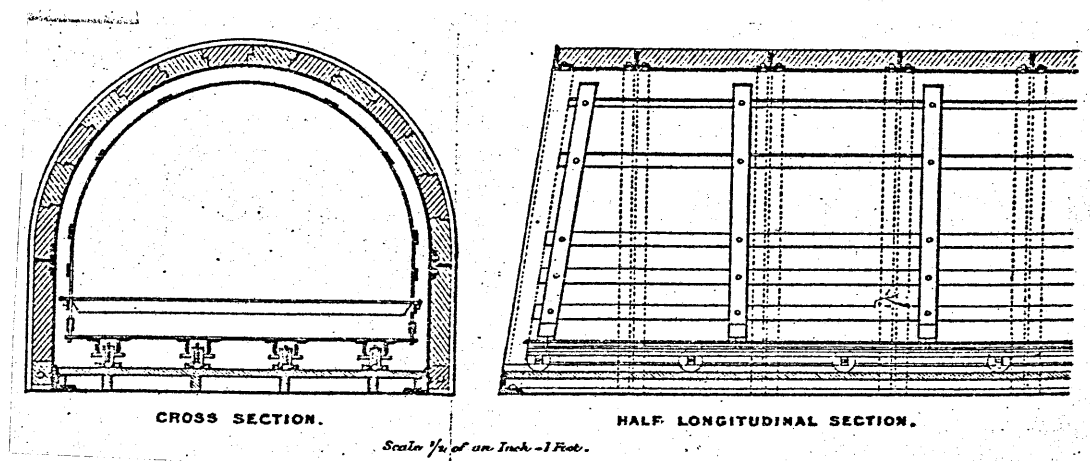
DETAILS OF THE ROLLING CARRIAGE USED BY BOWER FOR
